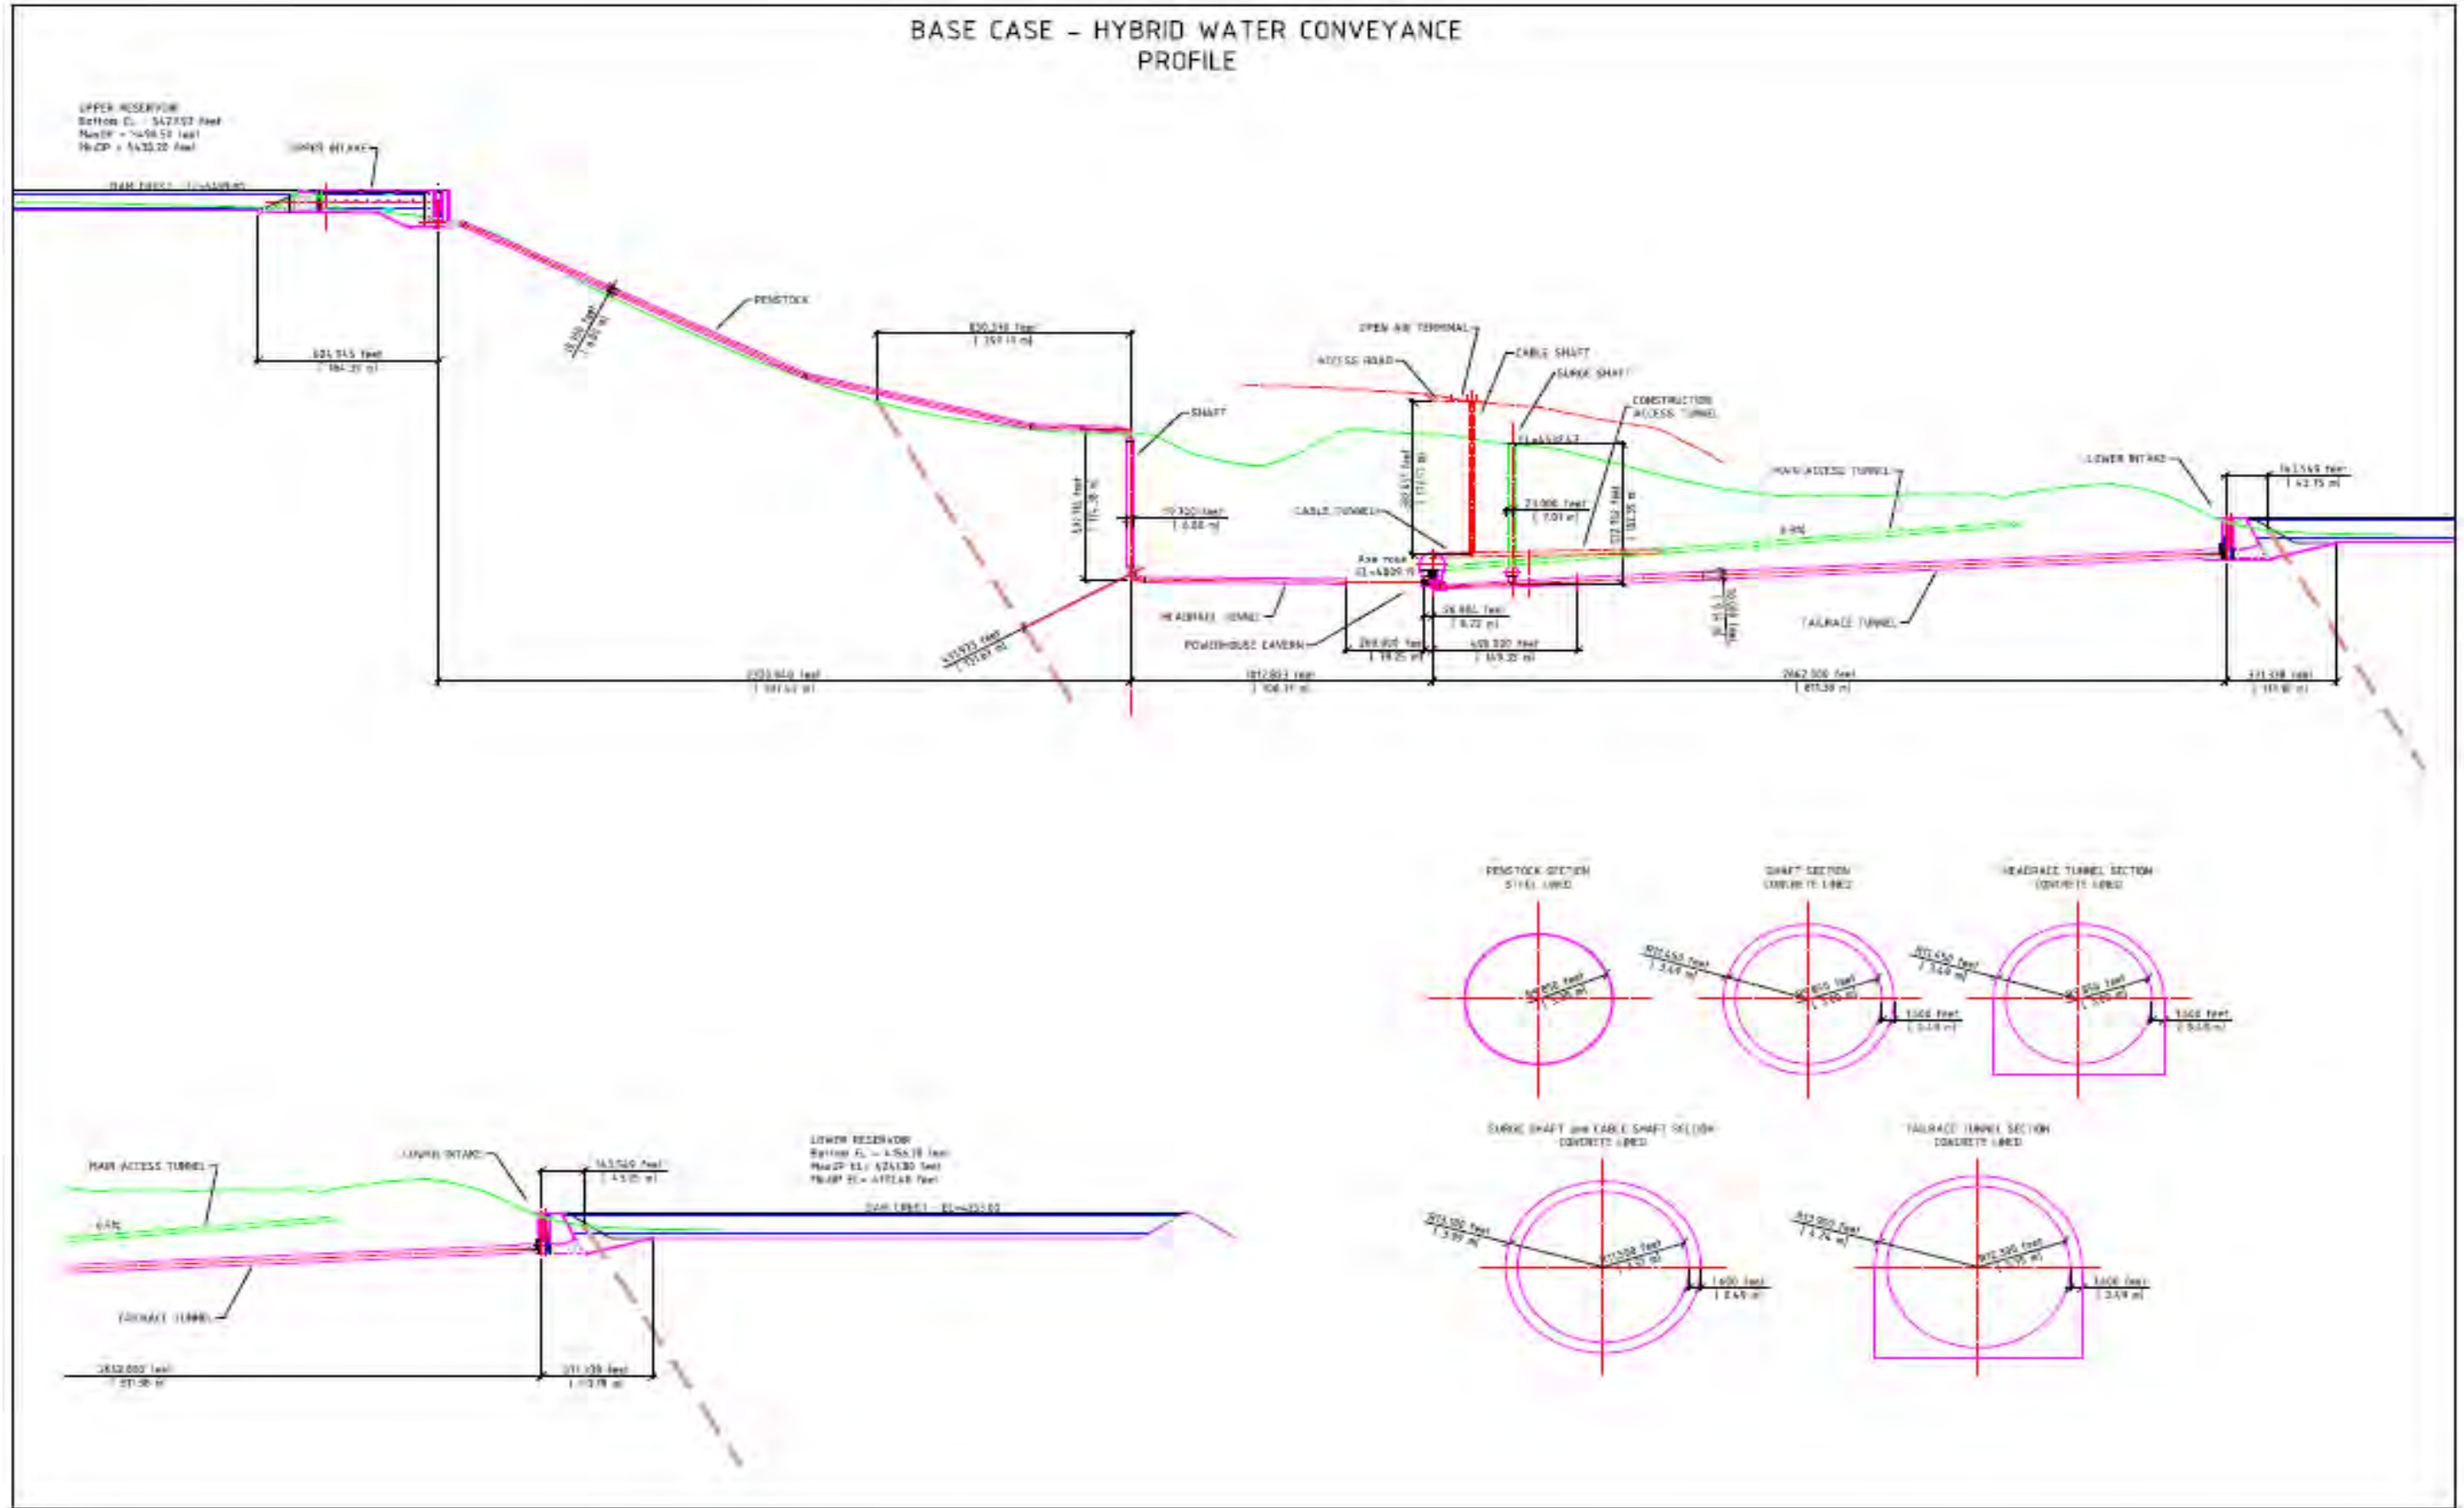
Swan Lake North Site Layout and Profile (Swan Lake North Pre-Application Document)
